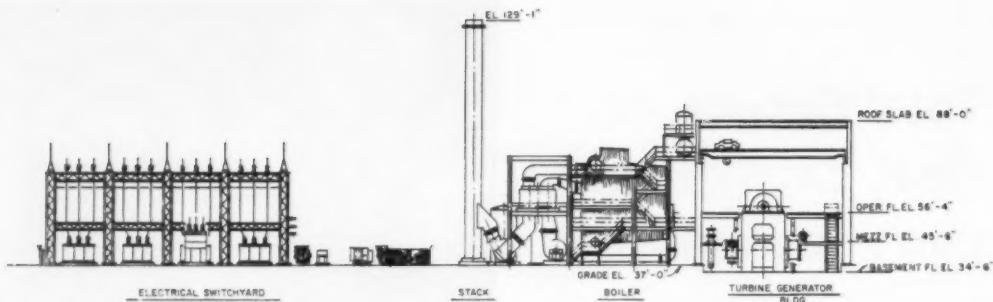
Cross sectional view of the entire 22 MW outdoor plant
